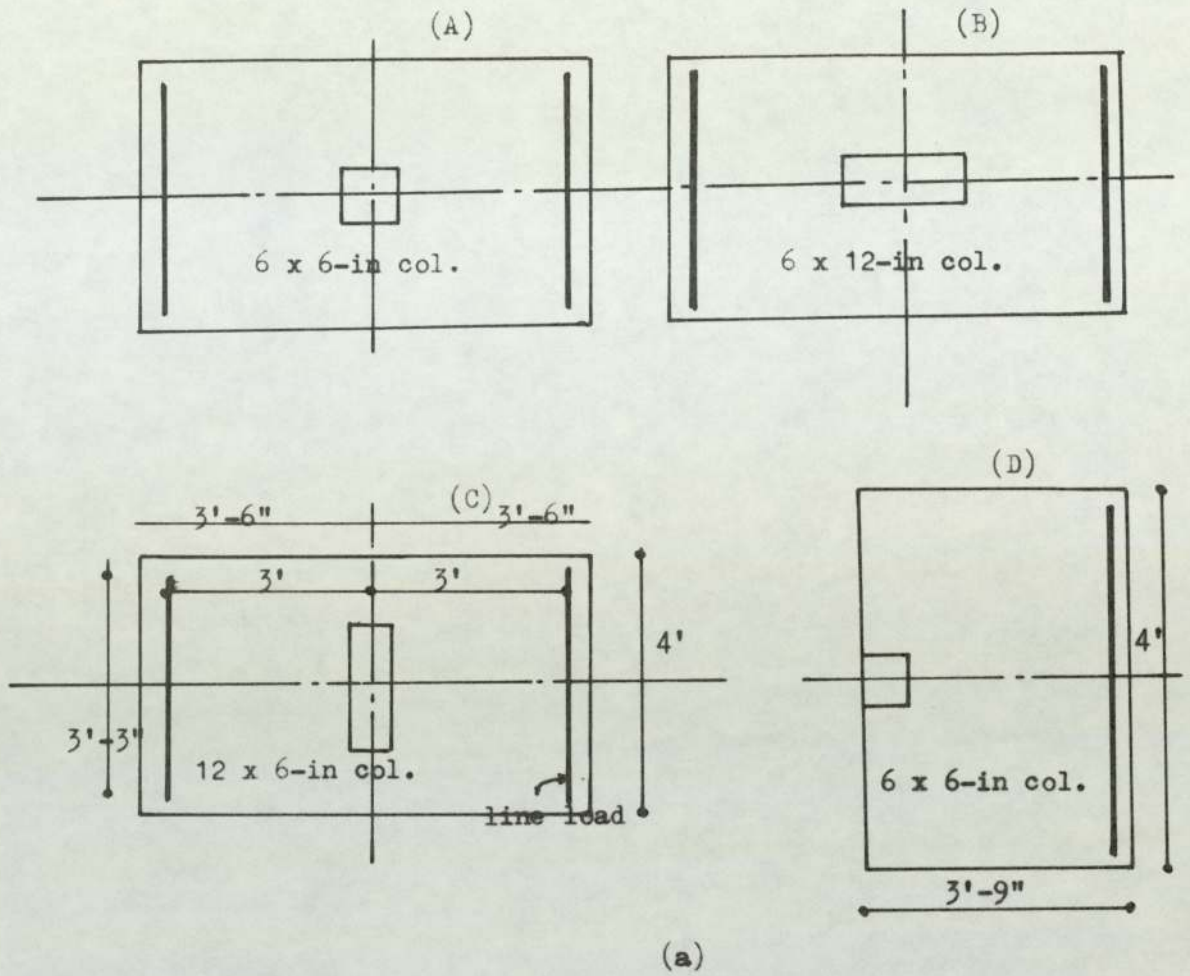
Hanson and Hanson's test specimens and loading arrangement.
